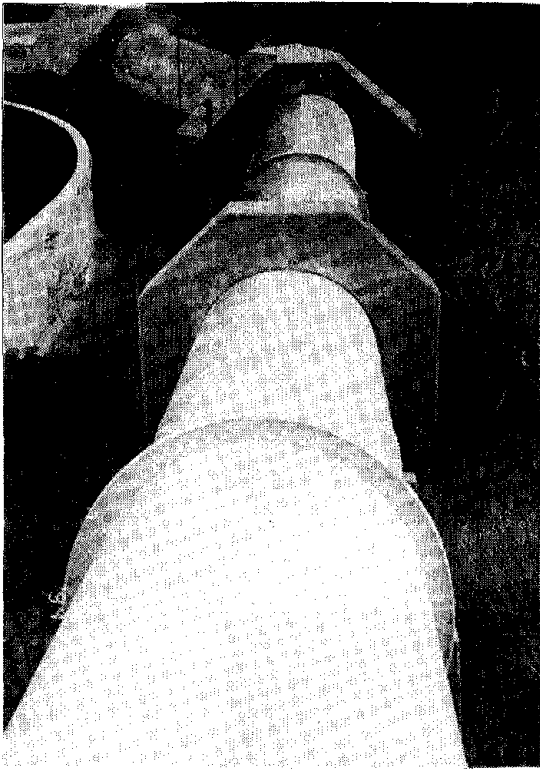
Local Buckling of a Water Pipe on Downslope of a Hill (Aqueducts Plant, DWP, City of Los Angeles)
